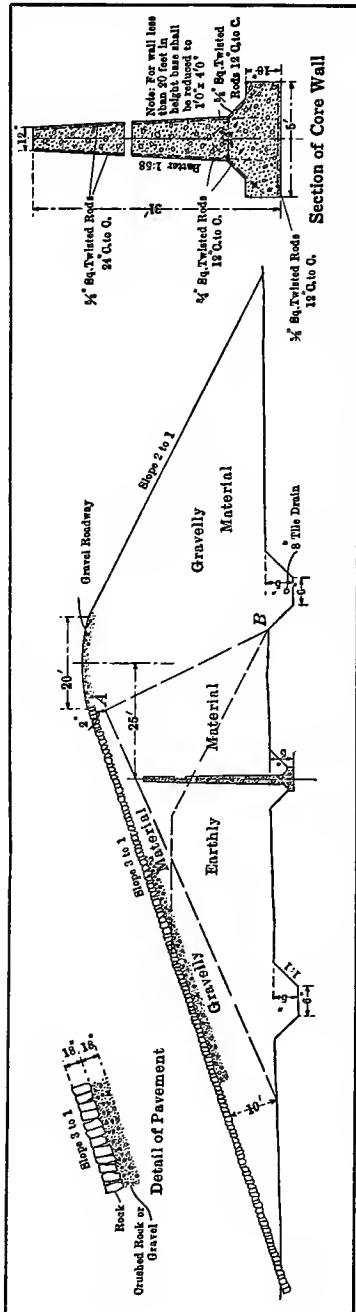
Section of earth dike with reinforced concrete core wall, Pathfinder dam, North Platte Project, Wyoming.
